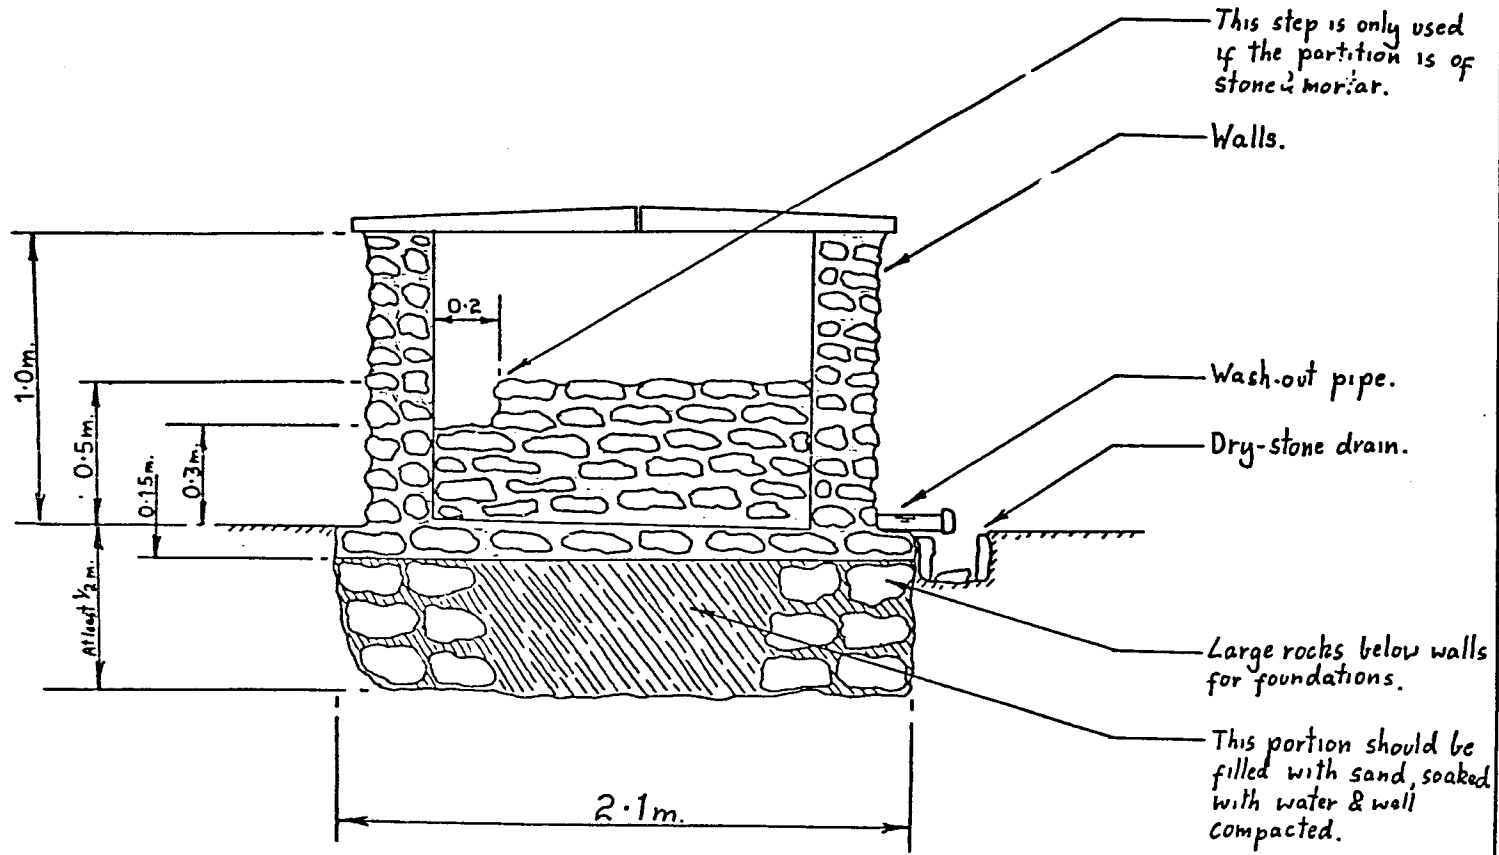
Collection chamber; Alternative to partition wall.
